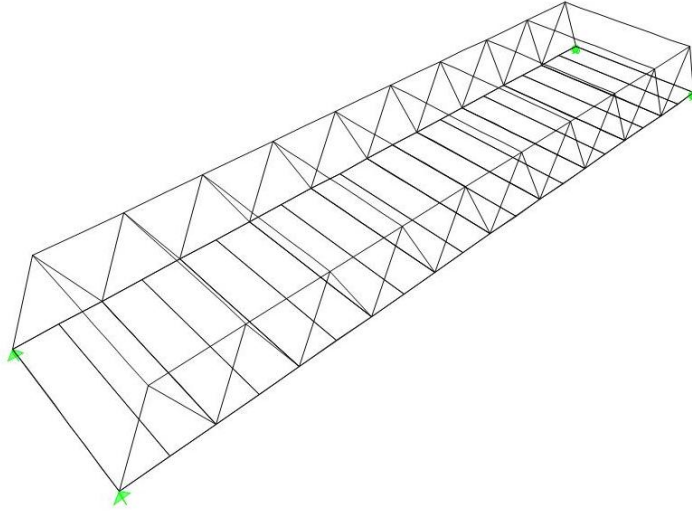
Pinned–rolled support truss type steel bridge FEM model
